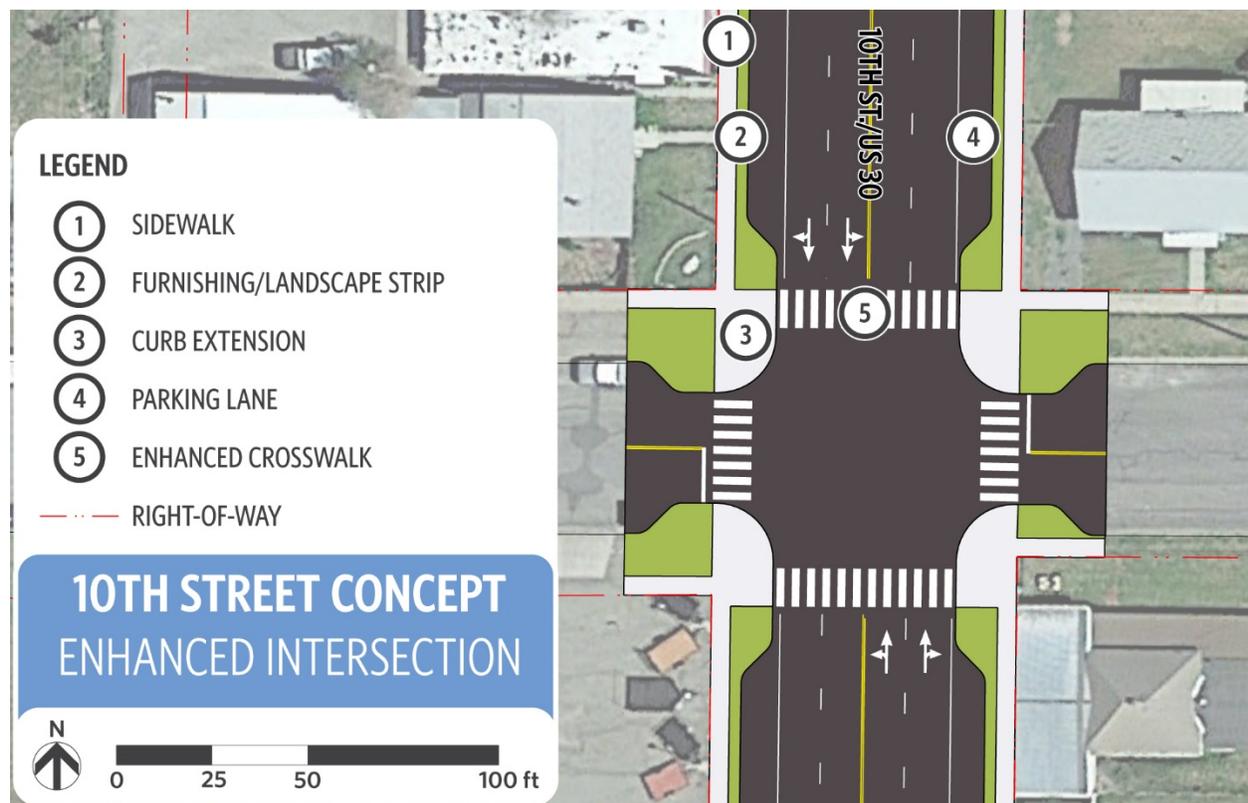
shows the proposed intersection modifications for typical enhanced intersections. These improvements are primarily intended to facilitate east-west crossings of 10th Street, and are proposed to be implemented at E Street, D Street, B Street, Campbell Street, and Church Street. The proposed design includes curb extensions on all four corners to minimize crossing distances, continental style marked crosswalks, and signage alerting motorists. Campbell Street improvements will include upgrading the signals with both a pedestrian countdown timer with a leading pedestrian interval. The countdown timer upgrade will require replacing the existing pedestrian signal head. The leading pedestrian interval will take additional investigation during the project's design phase to confirm the model of signal controller to properly gauge upgrade scope and costs. The proposed improvements would not require any additional ROW.
